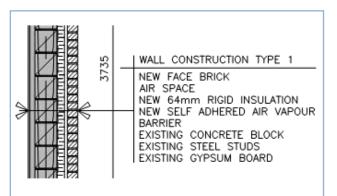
Typical wall construction - Type 1; Reference Architectural Drawings
